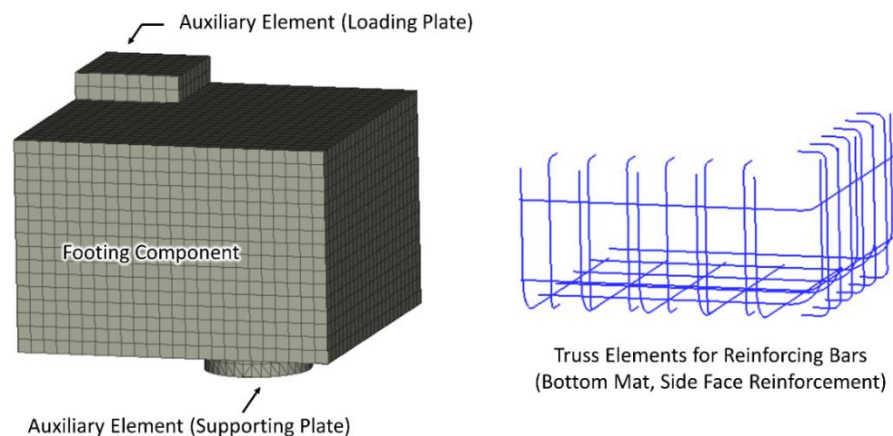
FE model developed for one-quarter drilled shaft footing (left) and truss elements developed for reinforcement (right)
